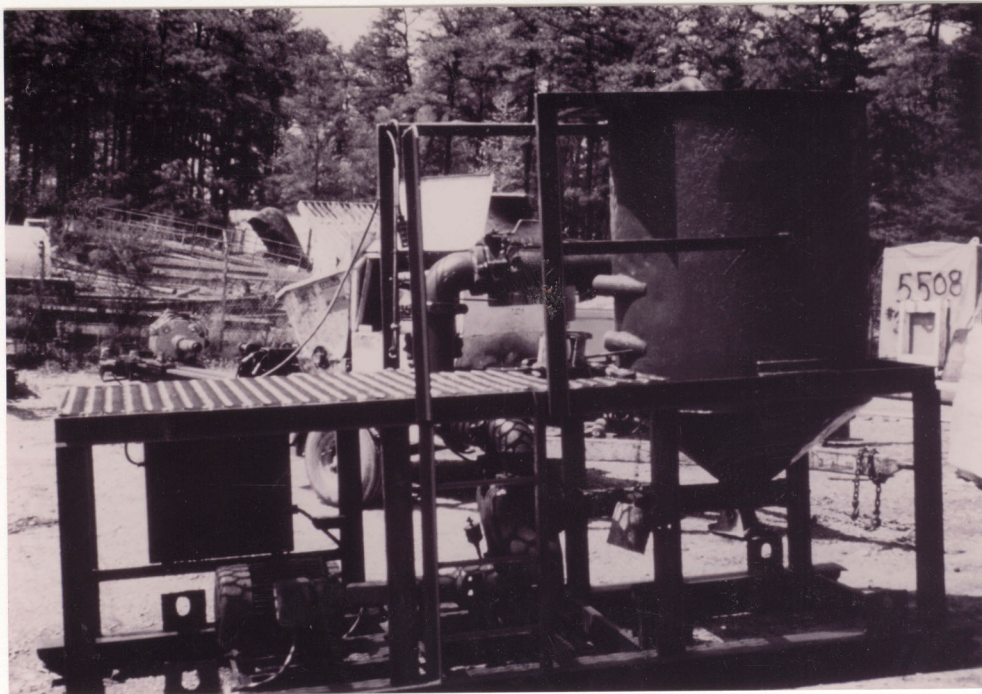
Electric-Powered, High-Shear HMG Grout Mixer.
